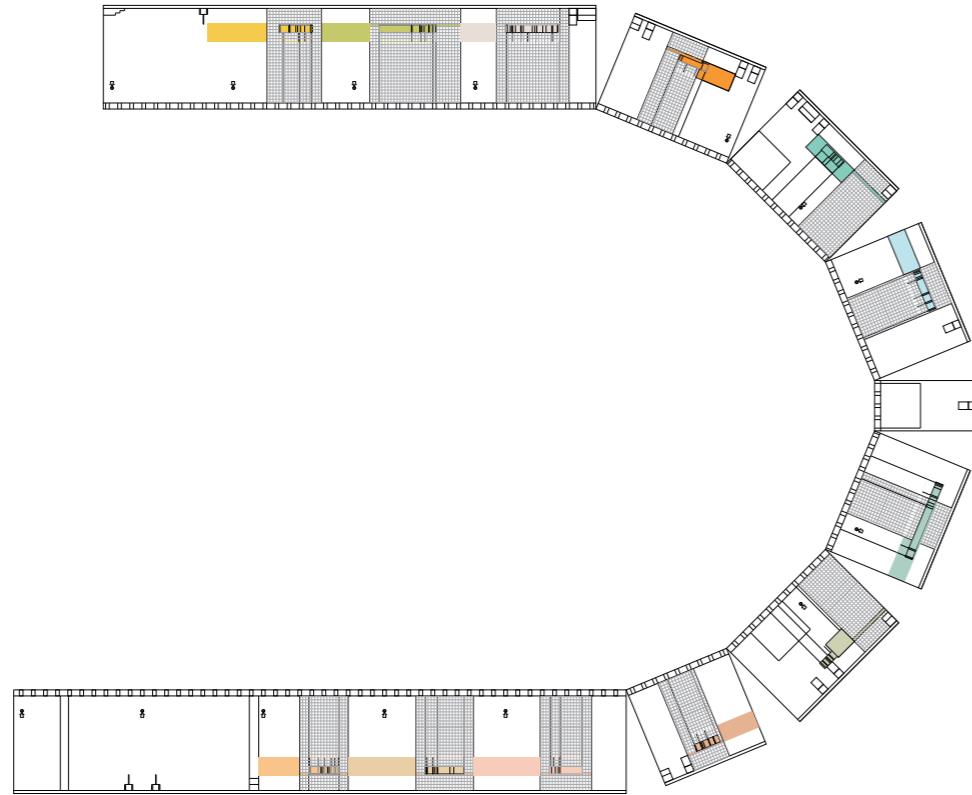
12 Hand-Drawn Paintngs on Elevation B
